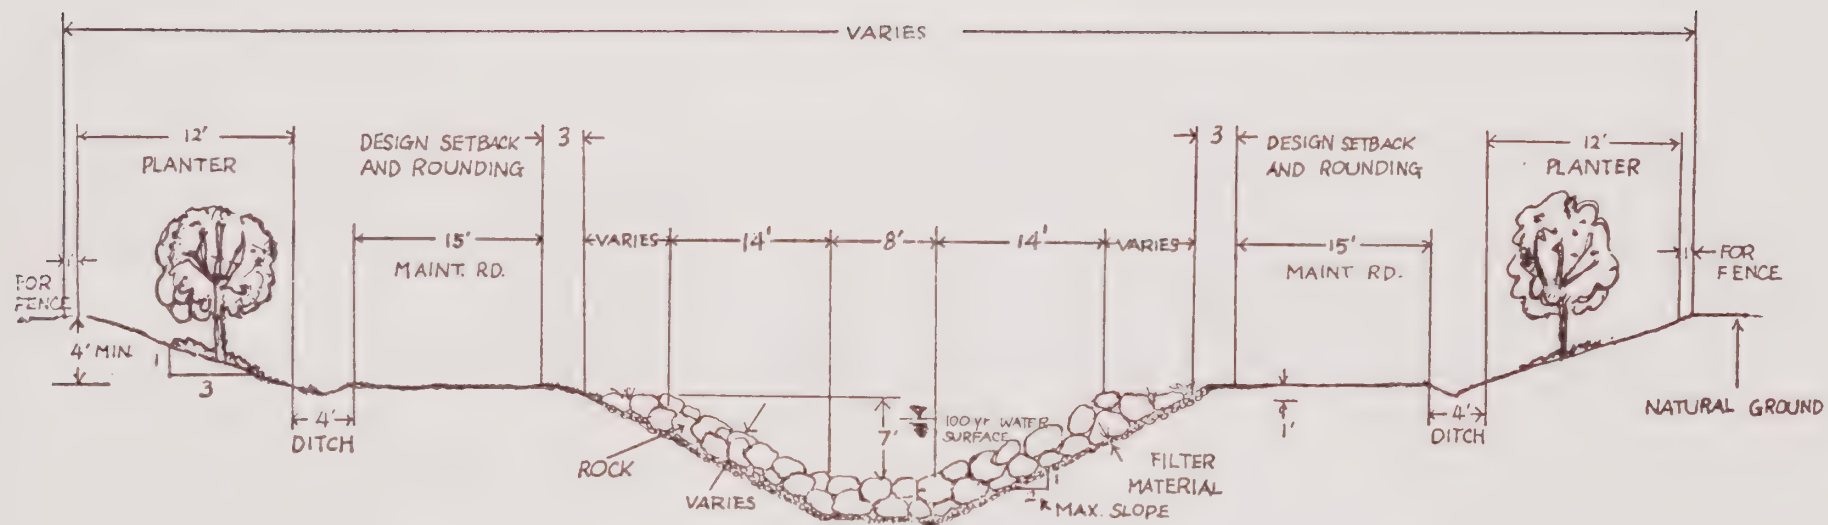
TYPICAL SECTION FOR ROCK-LINED OR GABION-LINED CHANNEL WITH DEPRESSED ROAD
